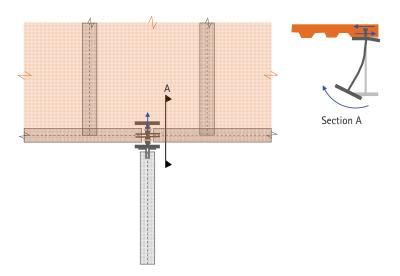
Diagram of inadvertent lateral bracing provided by torsional behavior of orthogonal girders when slab is intact (configuration similar to Column 70 at core shown, deformations exaggerated)
